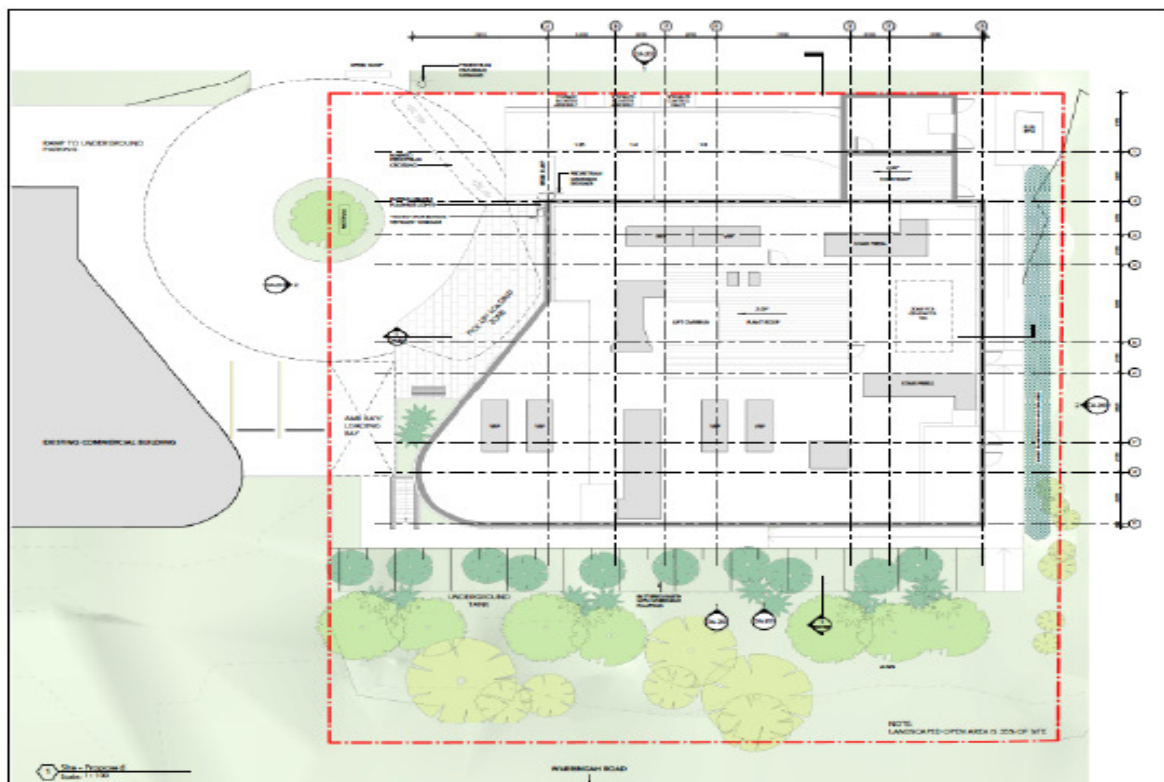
Site Plan Source: Architectural plan dated 4/12/2019 and prepared by Team 2)
